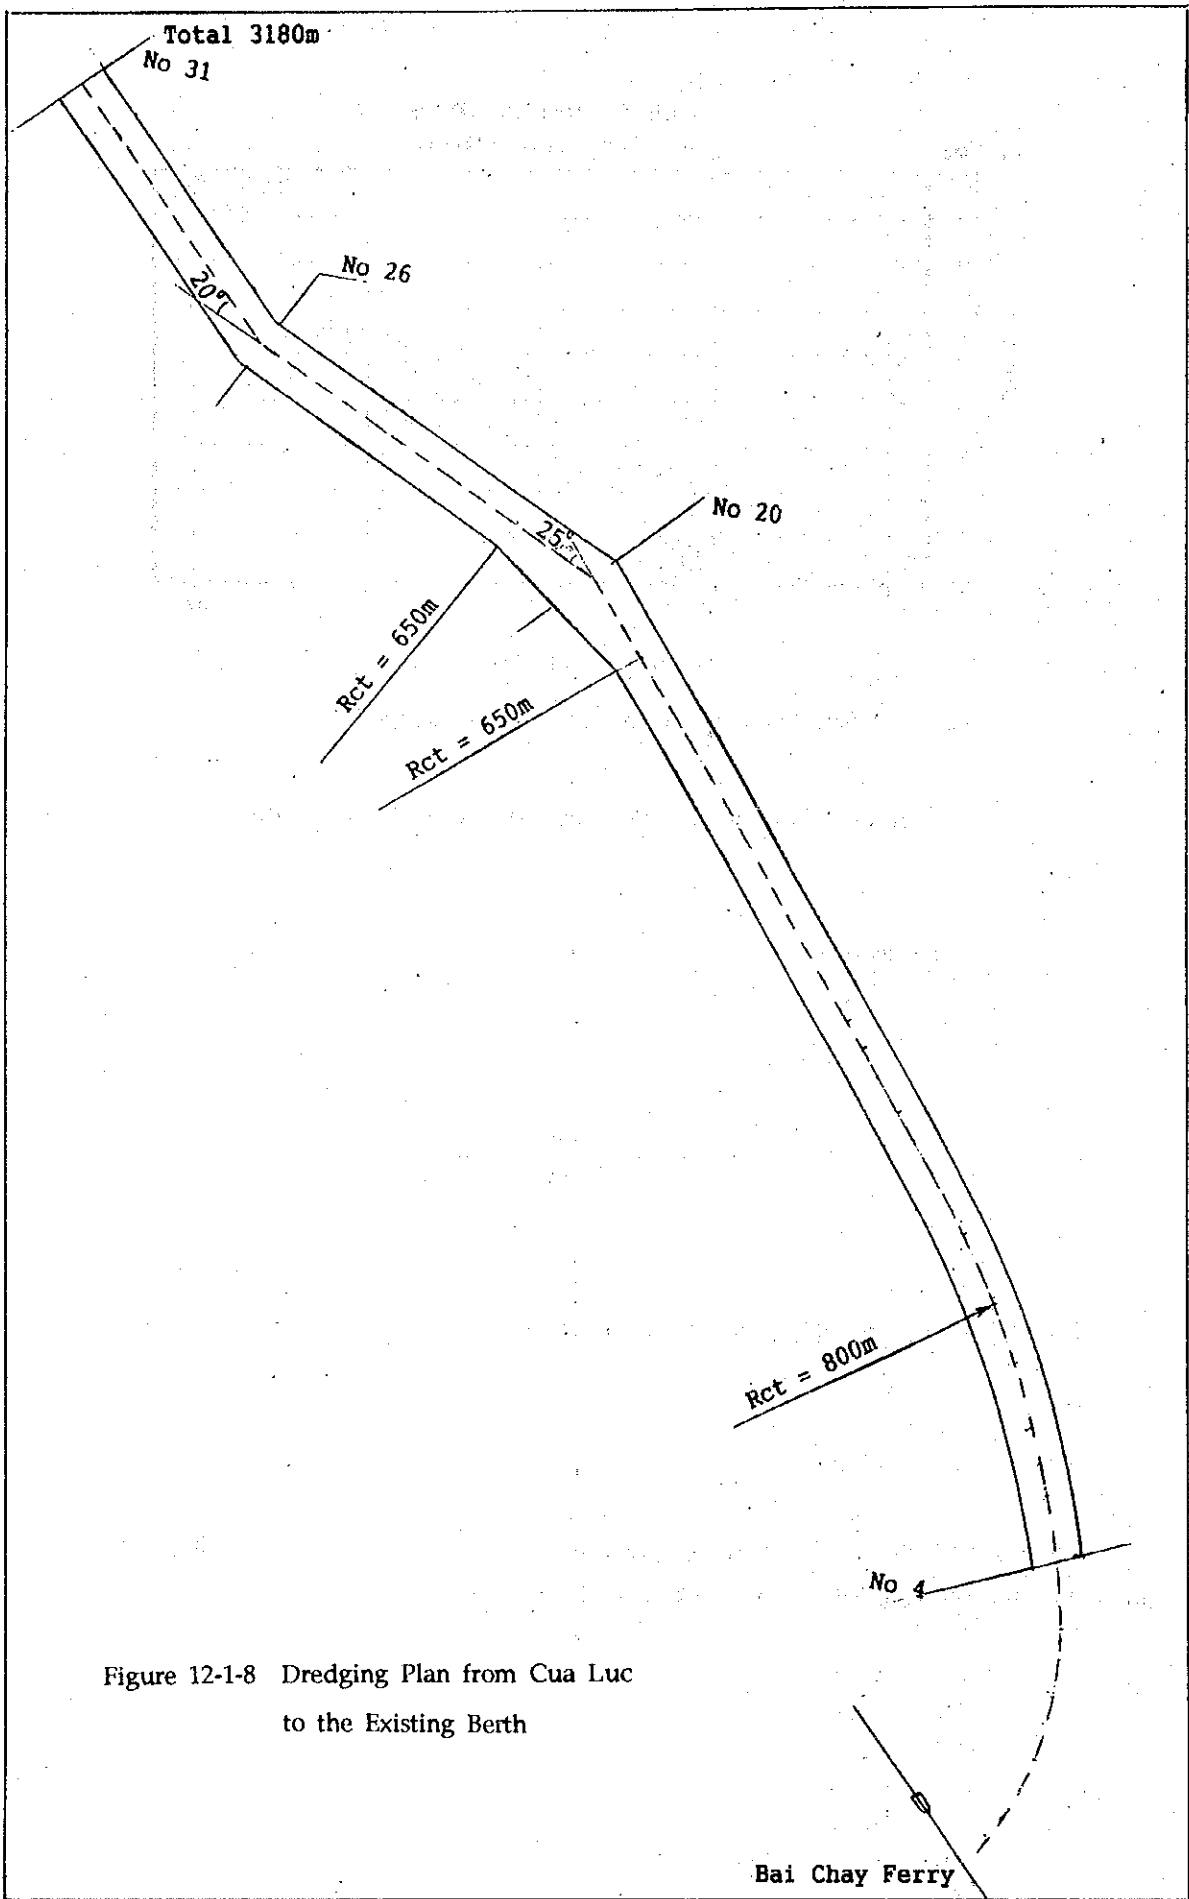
Dredging Plan from Cua Luc to the Existing Berth
